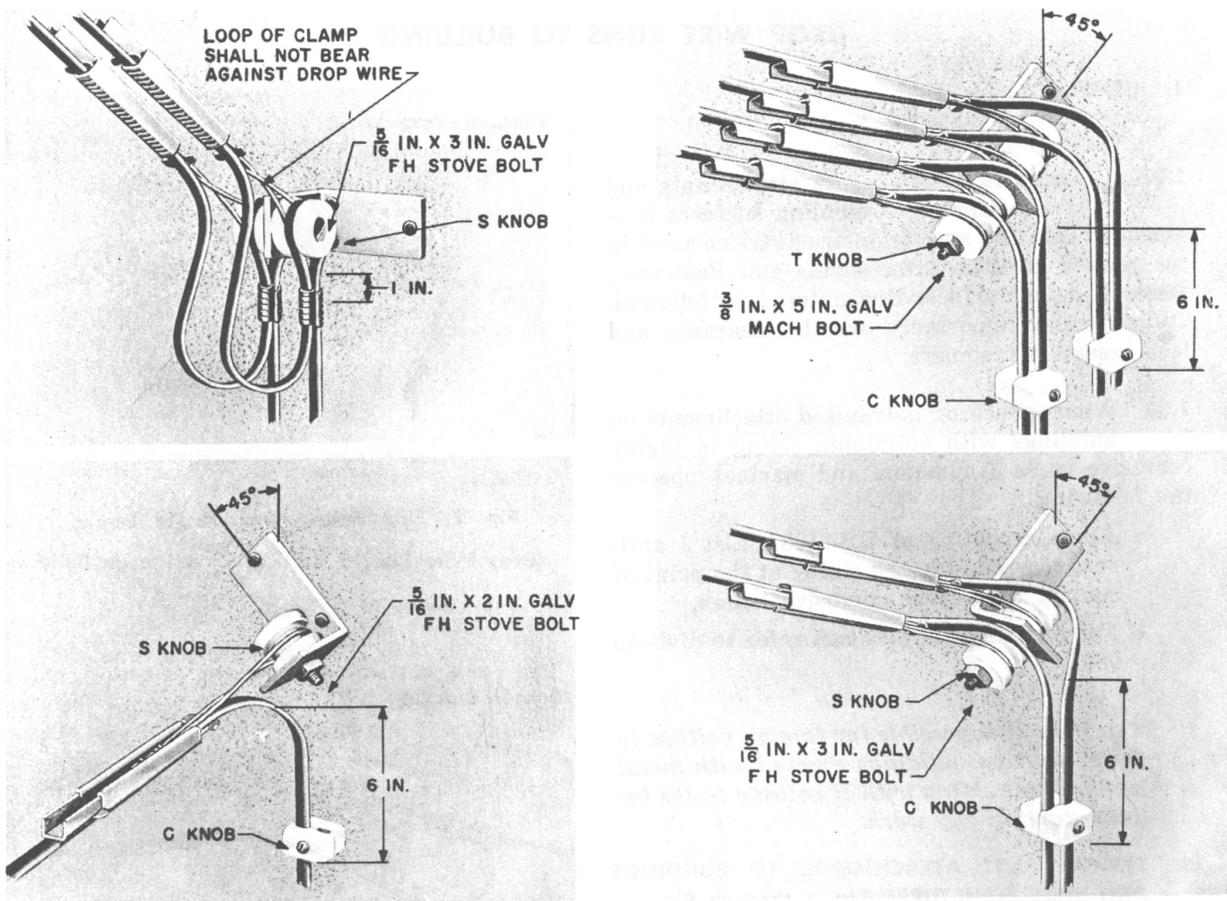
First Attachment, House Bracket (Drop Wire Run in Vertical Direction on Building)
